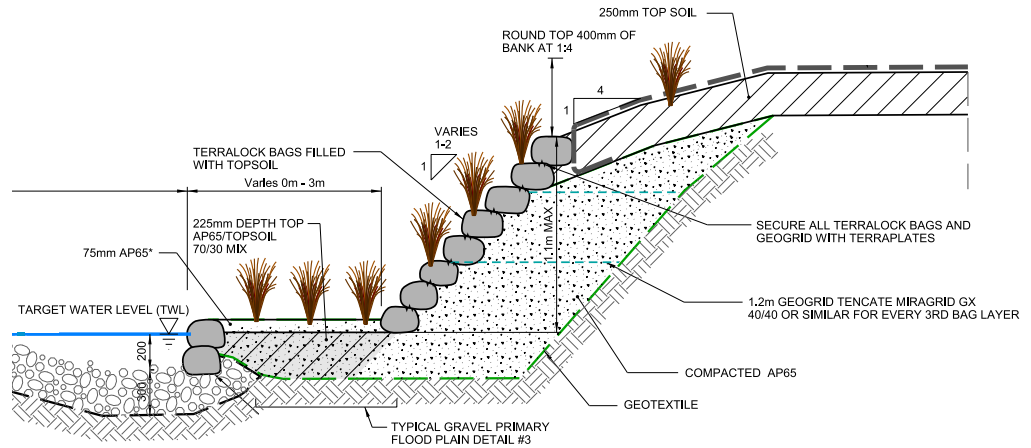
Example of the use of a geotextile bag wall for steep banks.
